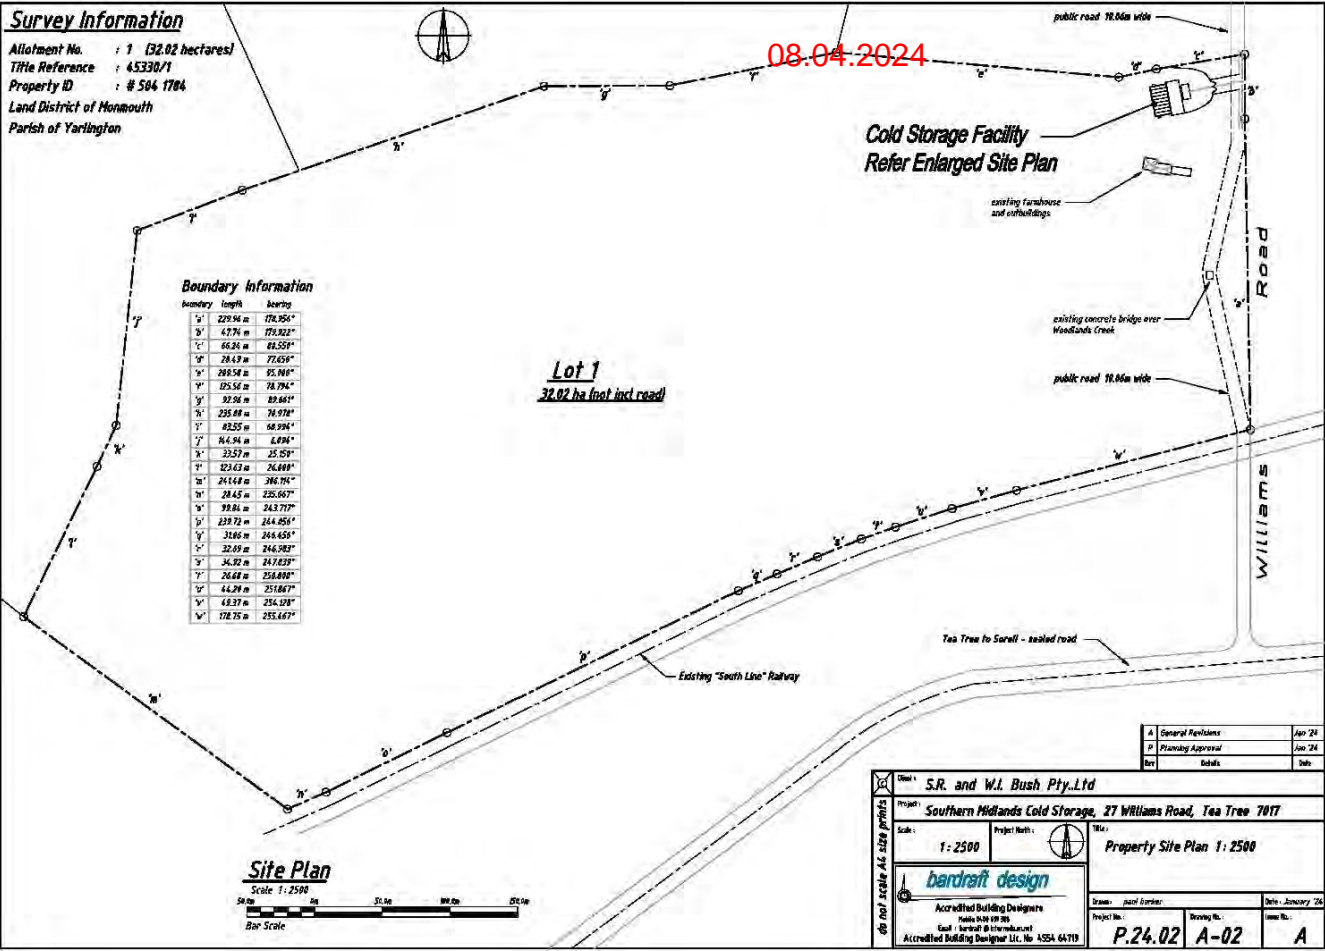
Proposed cool storage facility plan overview (source bardraft design, drawing number A-02)
